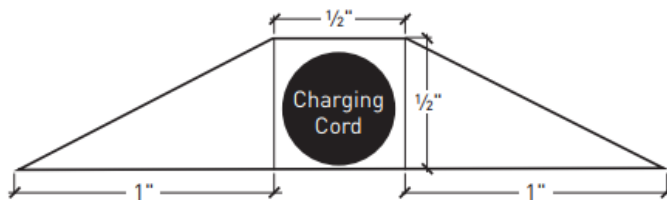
CROSS-SECTION OF RAMP REQUIREMENTS FOR UP TO $\frac{1}{2}$ INCH
